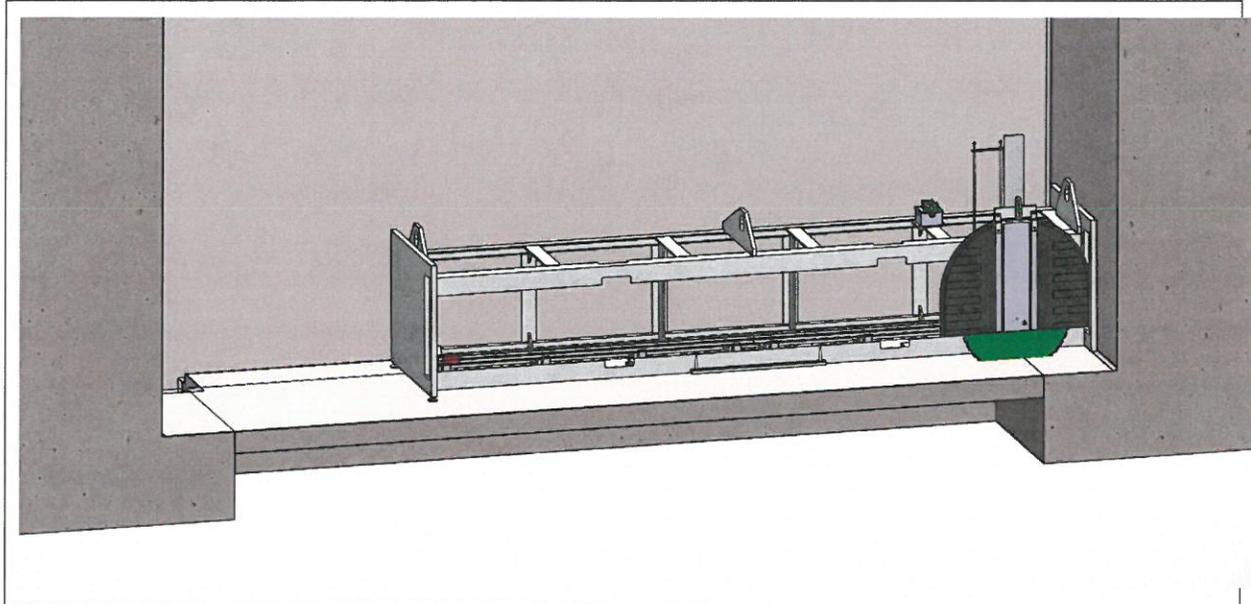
Cross Section of Saw Cutting Floor in the Corner of B-Cell
